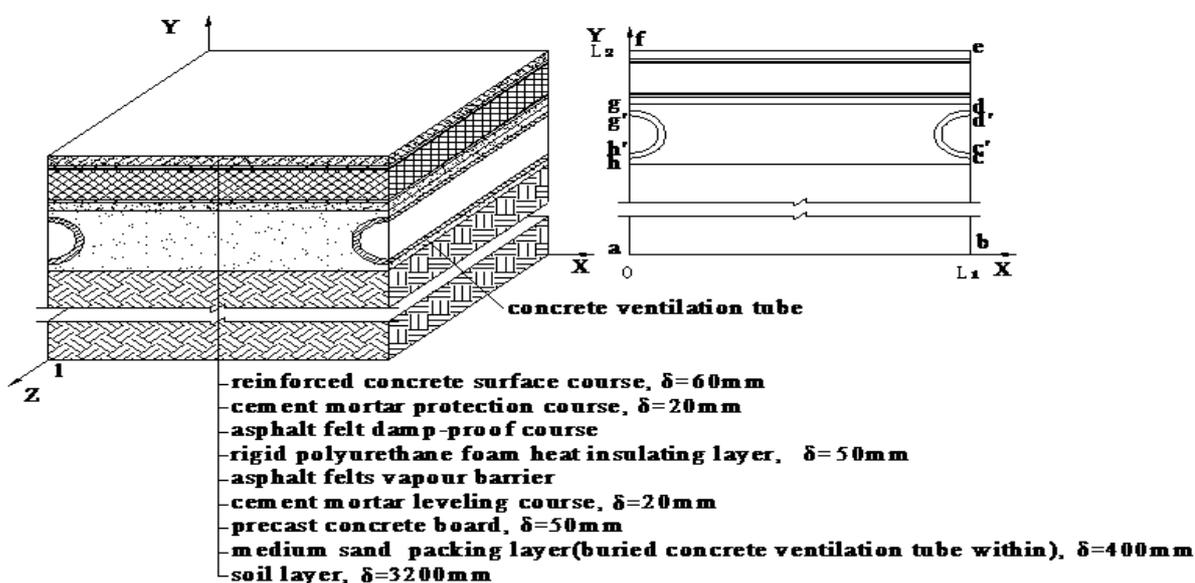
The calculating unit of heat transfer model for refrigerated warehouse floor
